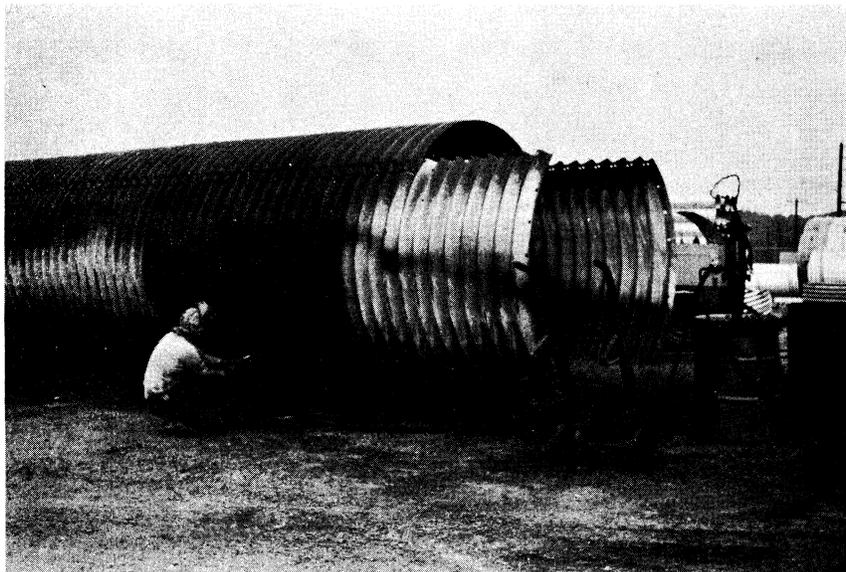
Application of asphalt mastic to structural plate pipe assembled at fabricator's plant.
